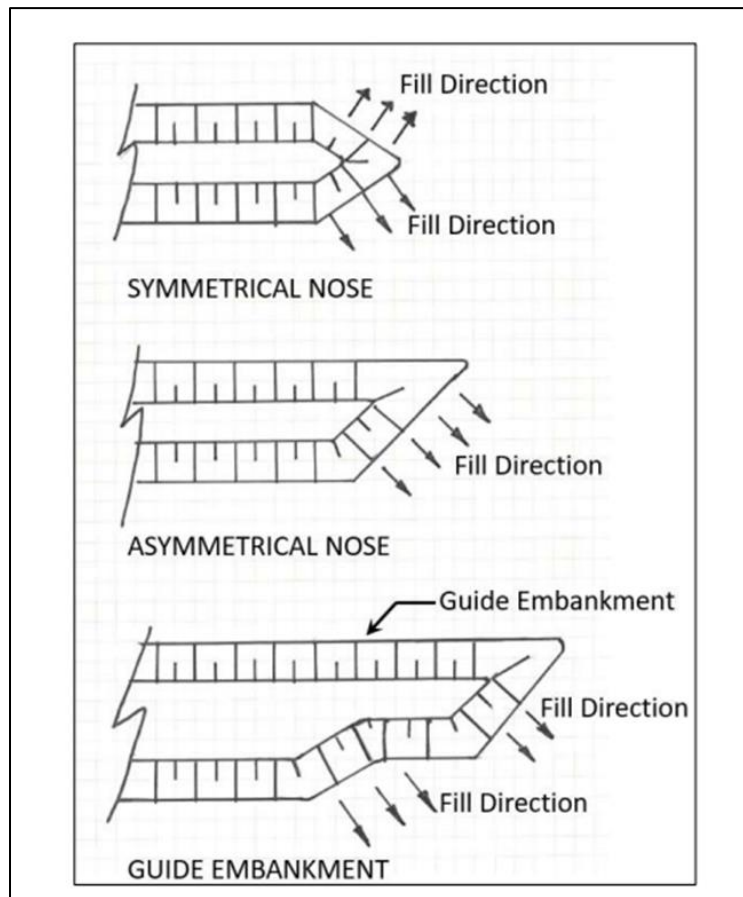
Utilizing a Guide Embankment When Building on Tailings
